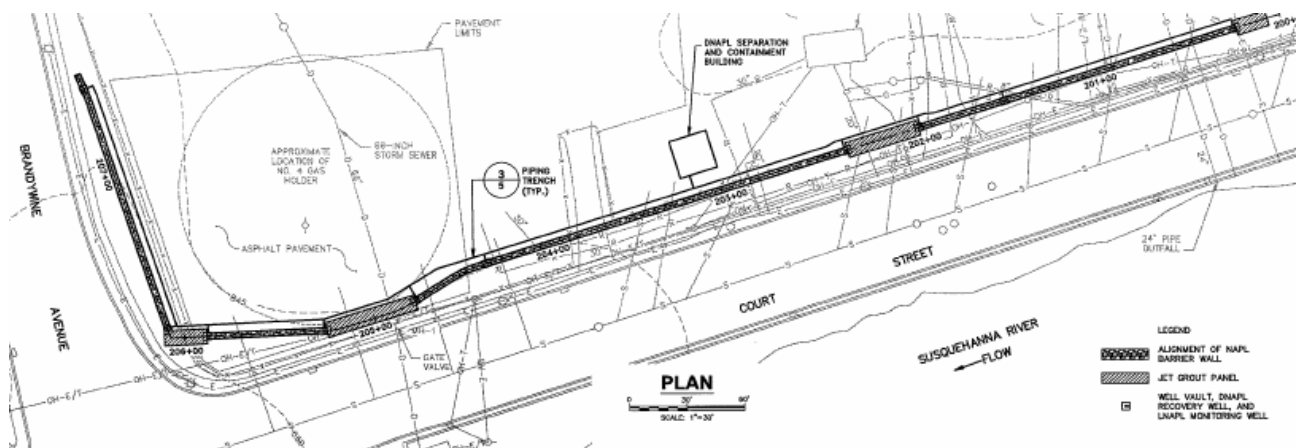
Site Layout and NAPL Barrier Alignment (North is towards the top of the page)
